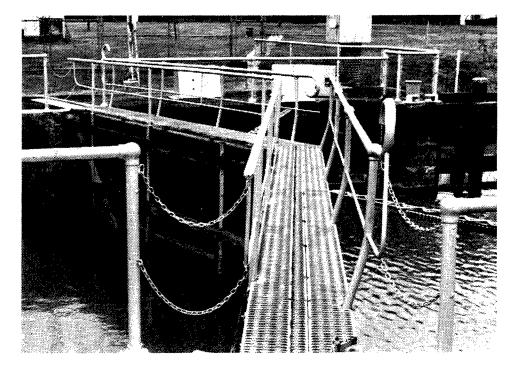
Photograph of the walkway atop the north end of tailbay lock gates, facing west - 1996.
